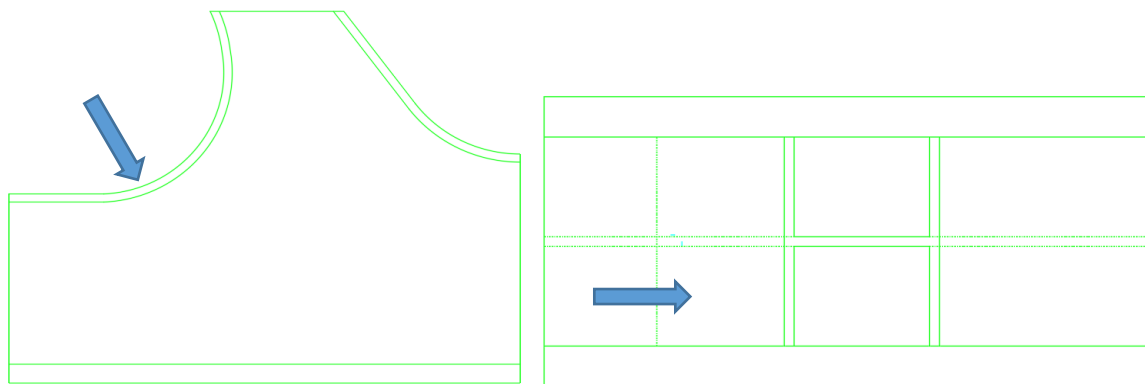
Residual Hole Location 2 - Elevation (left), Plan View (right)
